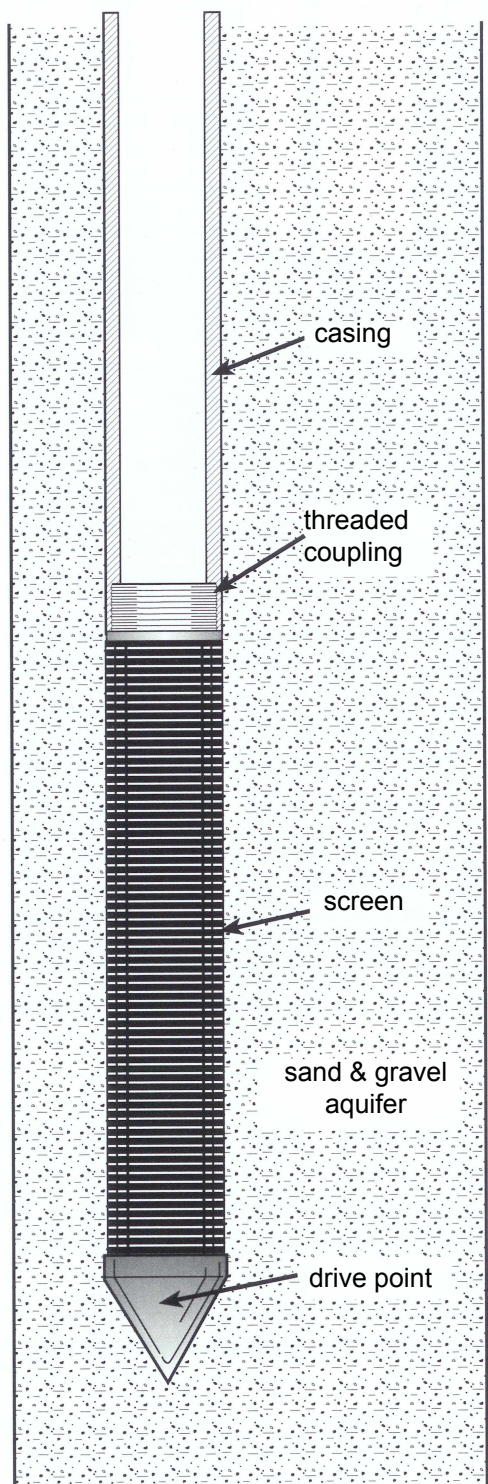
Driven well construction showing drive point, well screen and steel casing.
